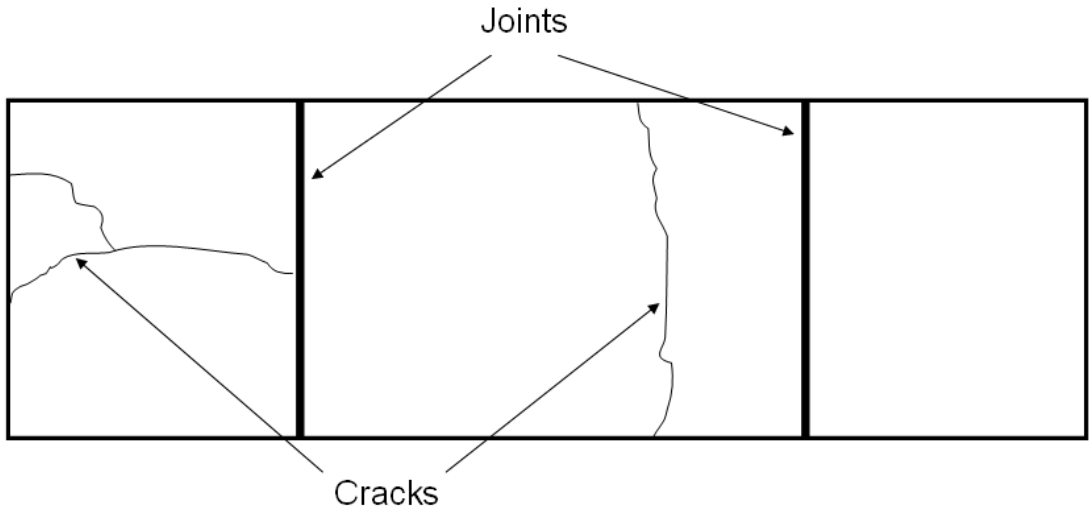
Cracks Recorded at the End of Loading: 4-inch TWT Pavement
